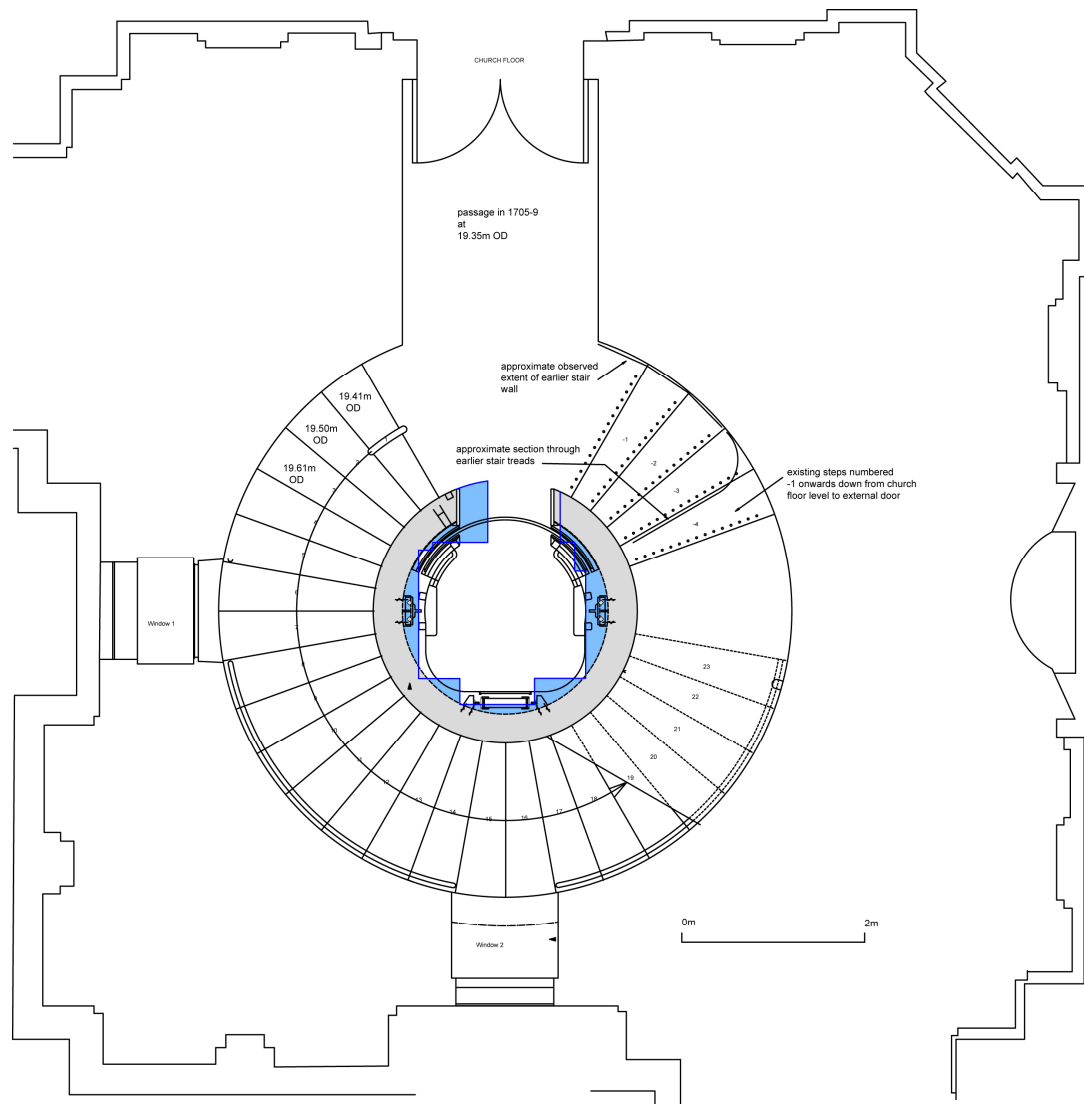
Plan of the stair at church floor level, showing the lines of the ashlar wall found below, and the approximate line of the observed section through the first-phase stair (adapted from PMT drawing SP170 5168)
